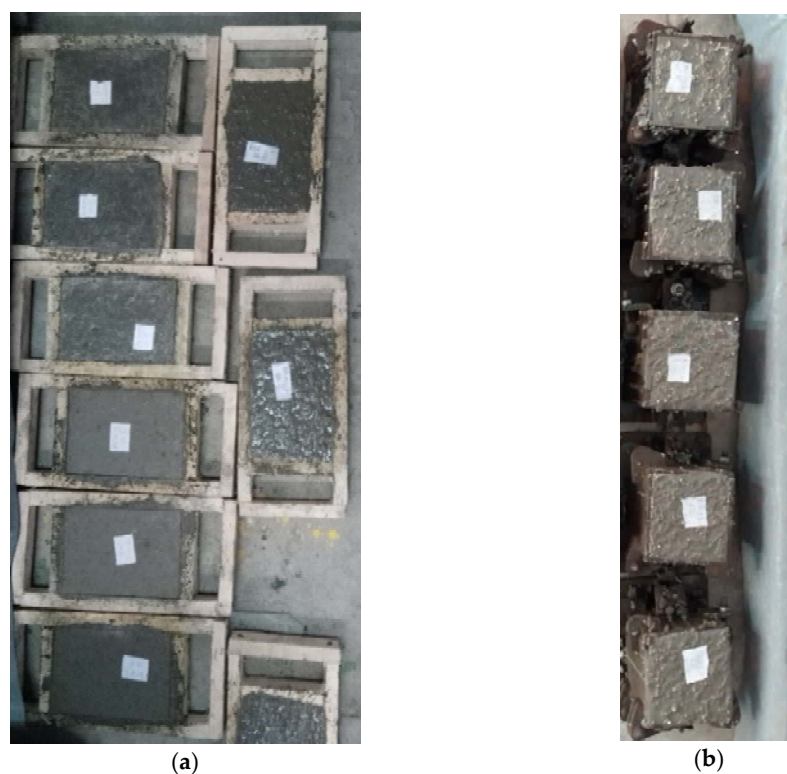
View of concrete samples: (a) cubic shape concrete samples, (b) plate shape concrete samples.
